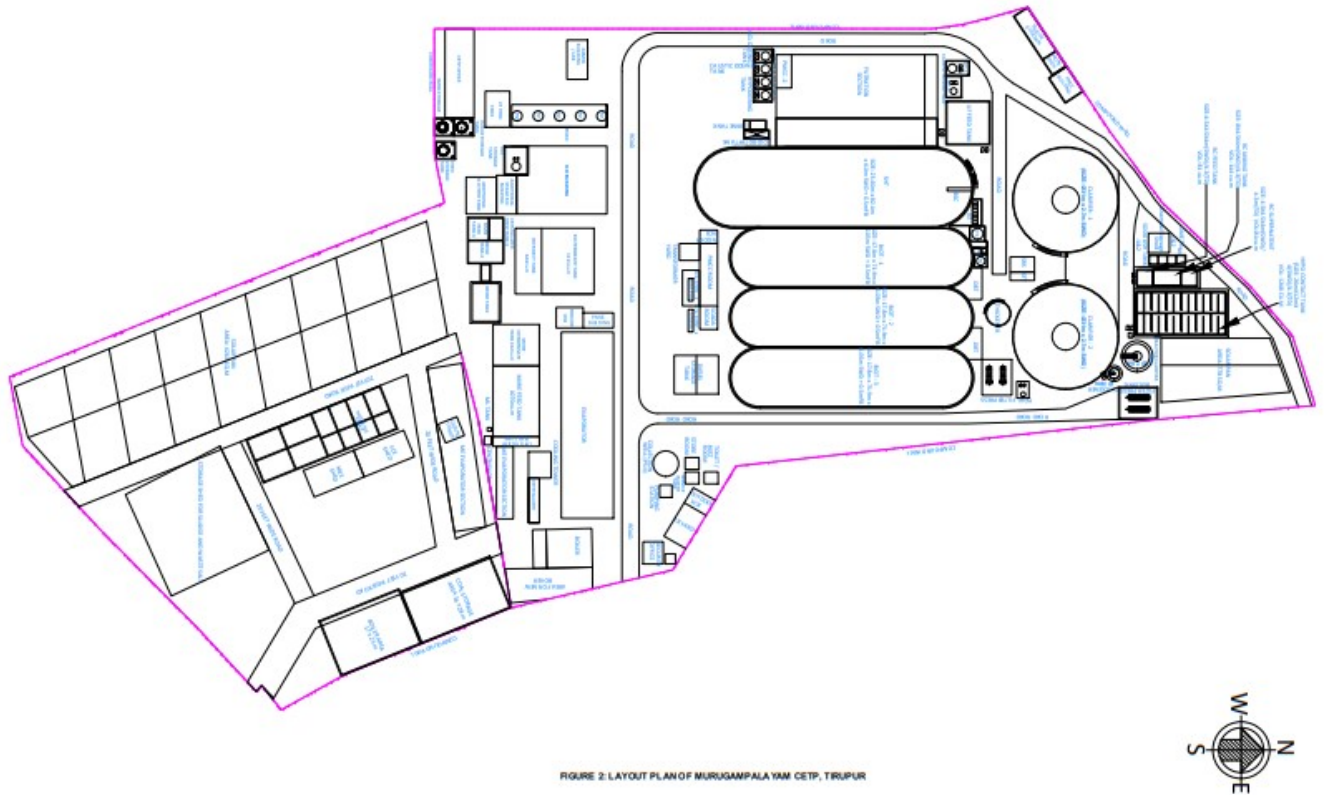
LAYOUT PLAN OF MURUGAMPALAYAM CETP, TIRUPUR
